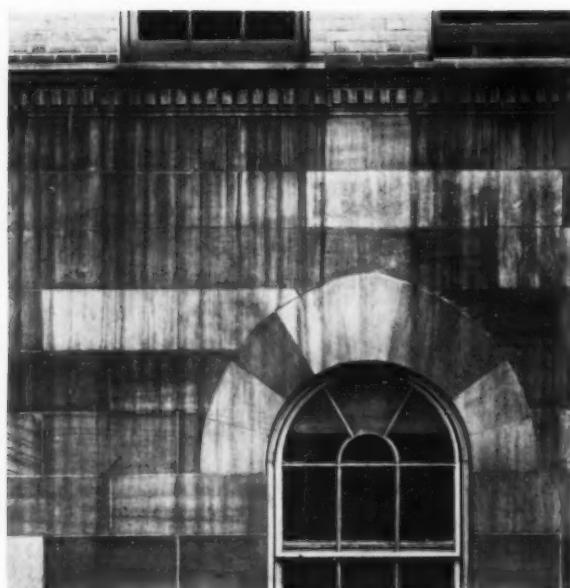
A drip should be provided beneath all horizontal surfaces to prevent the griming that is defacing this wall.
